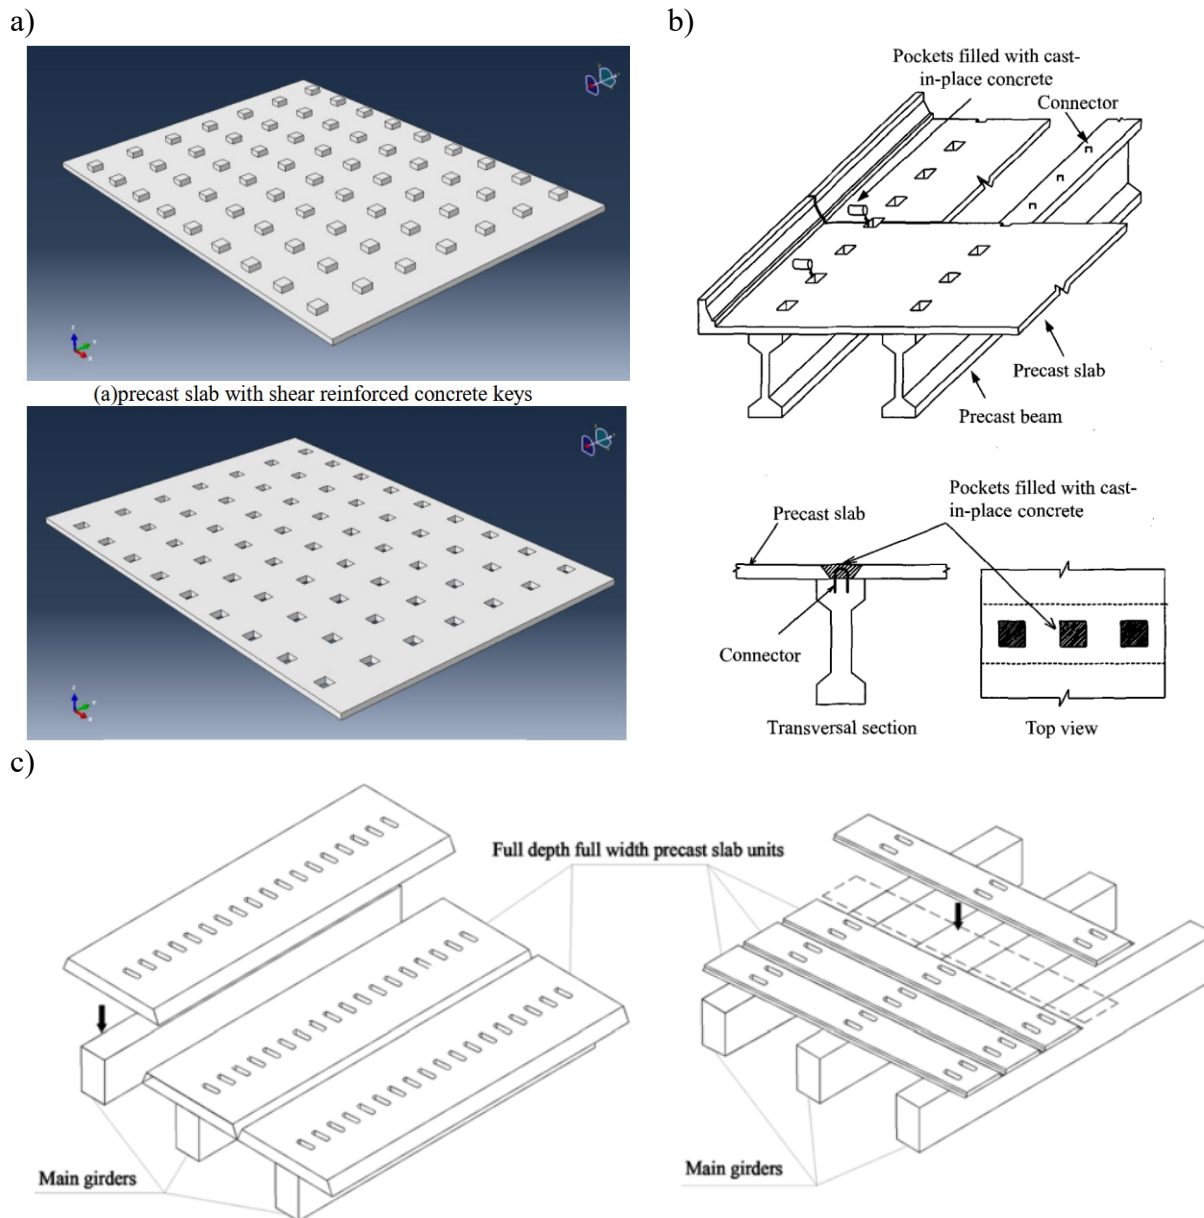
Composite concrete elements with shear-keys: a) slab of Li et al. research [95], b) girder concept of Araujo [36], c) concept of precast system by Afefy et al. [2]
